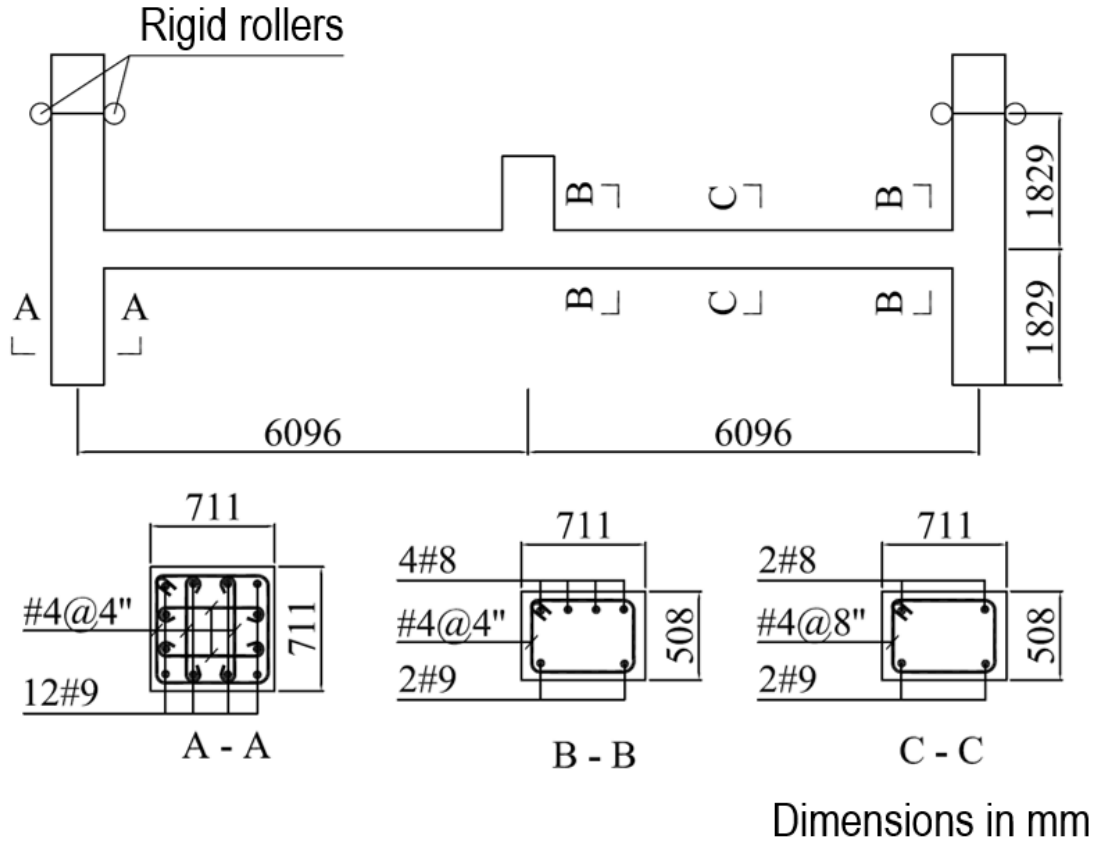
Structural layout for push-down test used to verify cohesive element model.
